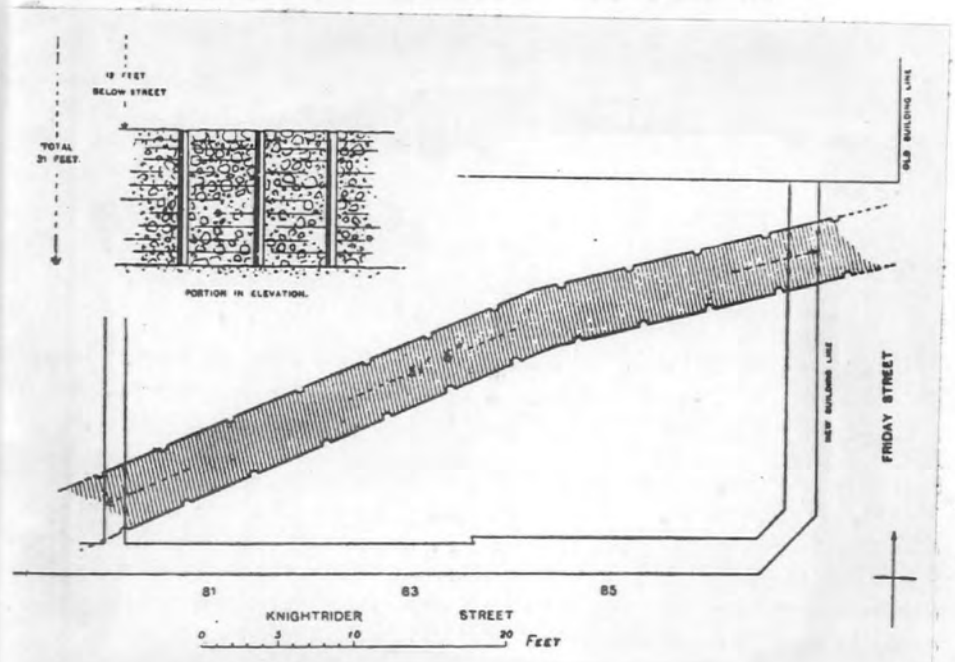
ELEVATION AND PLAN OF ROMAN WALL FOUND IN FRIDAY AND KNIGHTRIDER STREETS, LONDON, IN 1905
